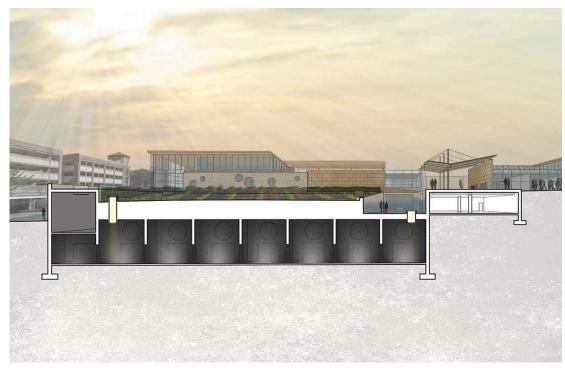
Longitudinal section of the winery showing relationship of vineyard to caves and building entry.
